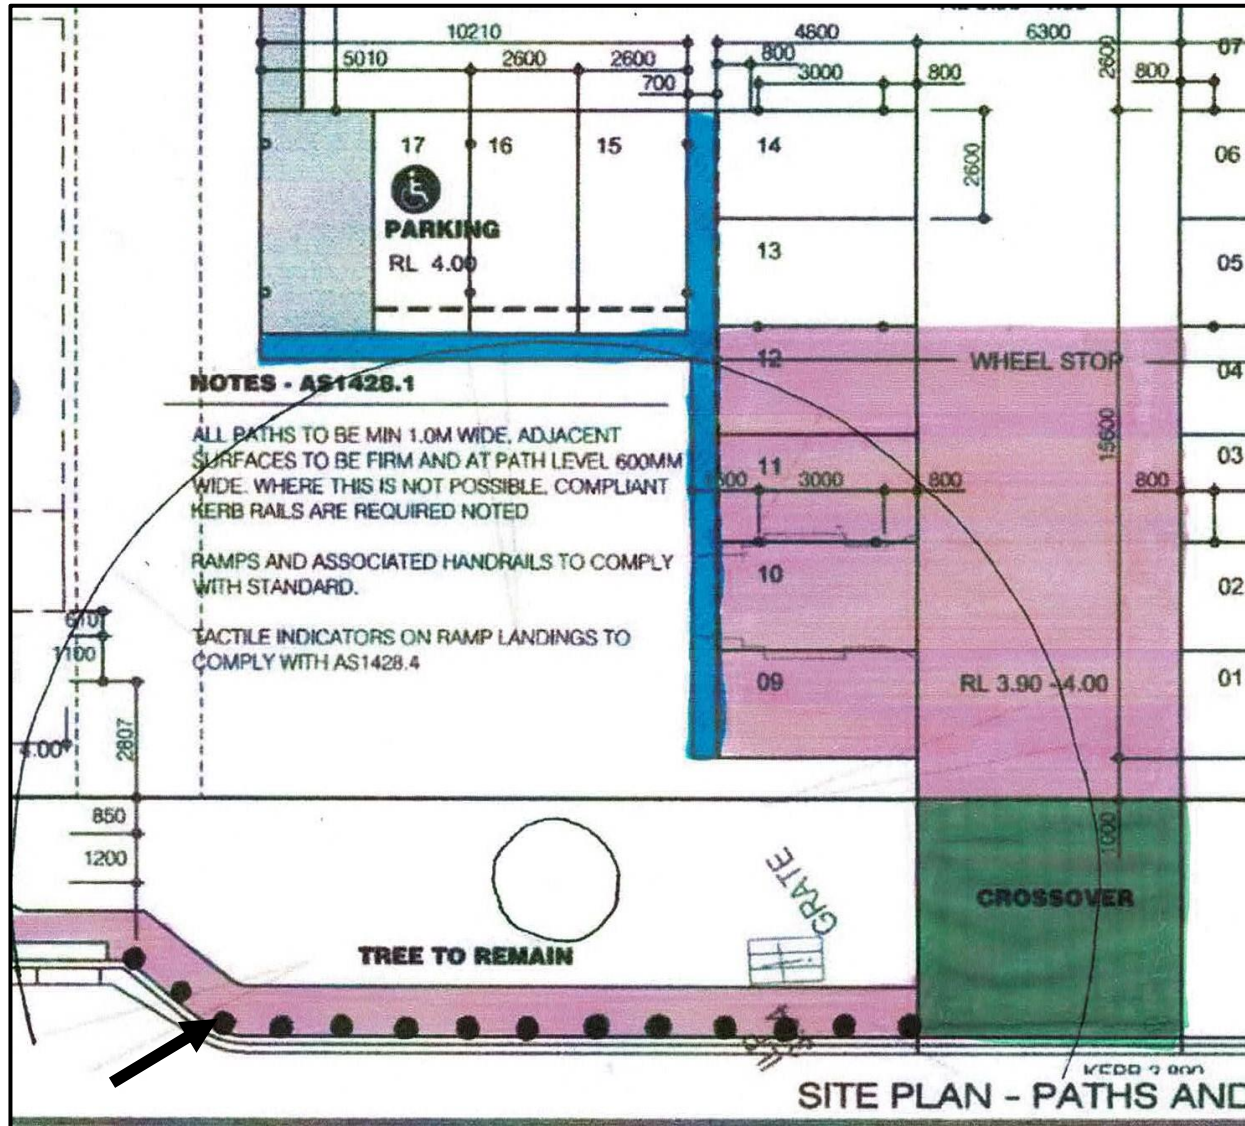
Specified turf or gravel cell (purple area), proposed bollard location (arrow pointing to black dots), proposed rock drain (blue) and proposed concrete crossover (green)
